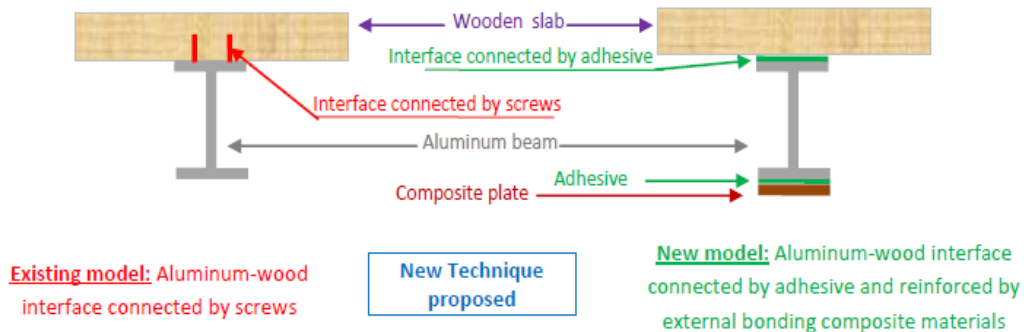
Cross-section view of mechanical connected (existing model) and adhesive bonded (new model) Aluminum-wooden composite beam
